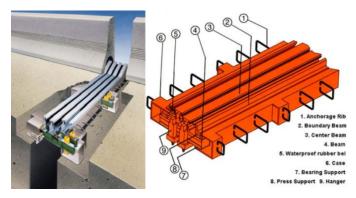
Modular bridge expansion joint (Wuxi, 2017)
